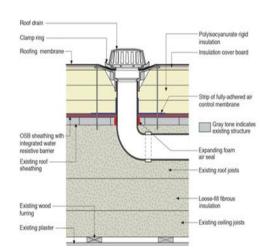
ROOF DRAINAGE USING DOWN PIPES.
